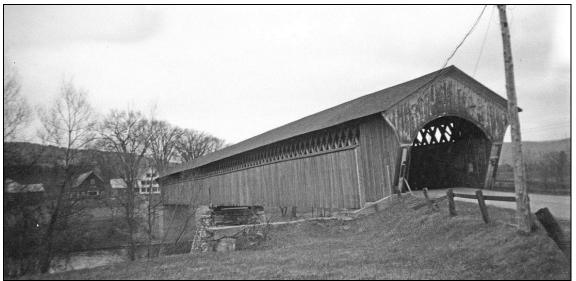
Covered bridge, Town lattice built 1850, reconstructed 1877 and destroyed by 1927 Flood. Vermont end shown in November 1922 (Storrs).
